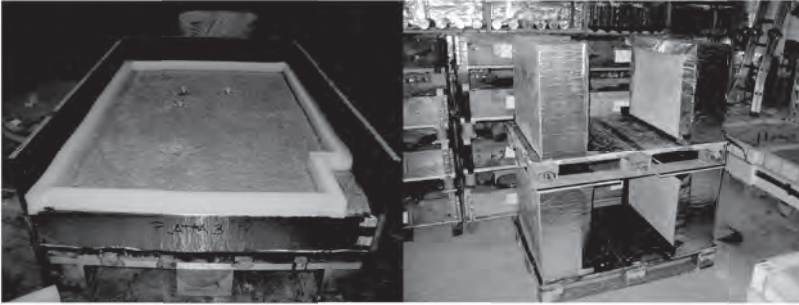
Left picture shows one floor construction in Batch 1 prepared for screed application, one corner was spared for sample extraction from the slab. Right picture shows four floor constructions from Batch 2, vertically tilted in a climate conditioned room and not yet covered with screed.
